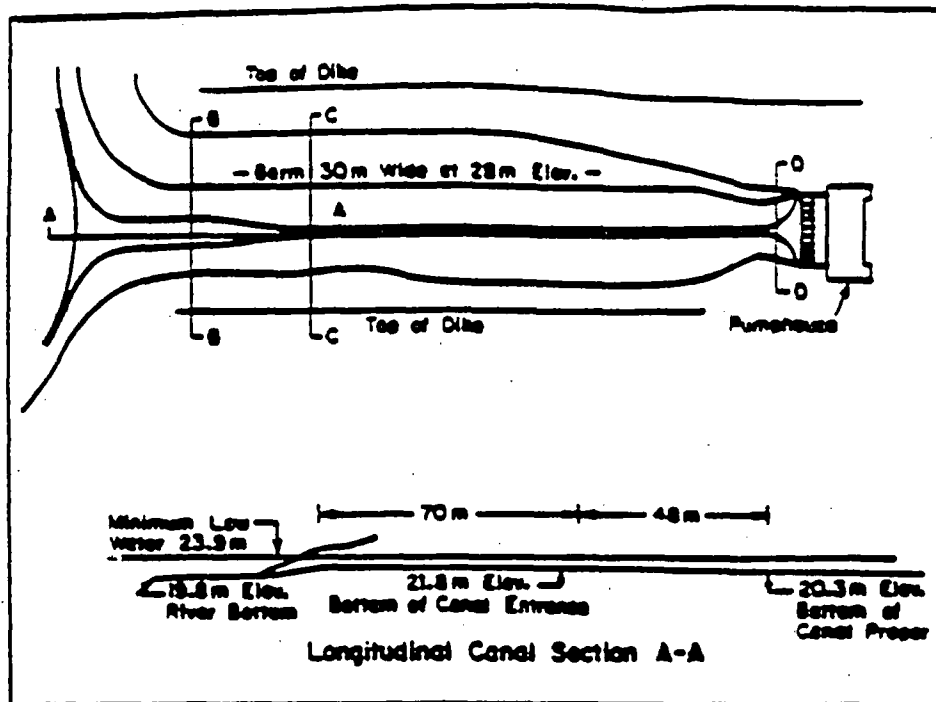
Plan View and Longitudinal Section of Entrance of 3G Canal
